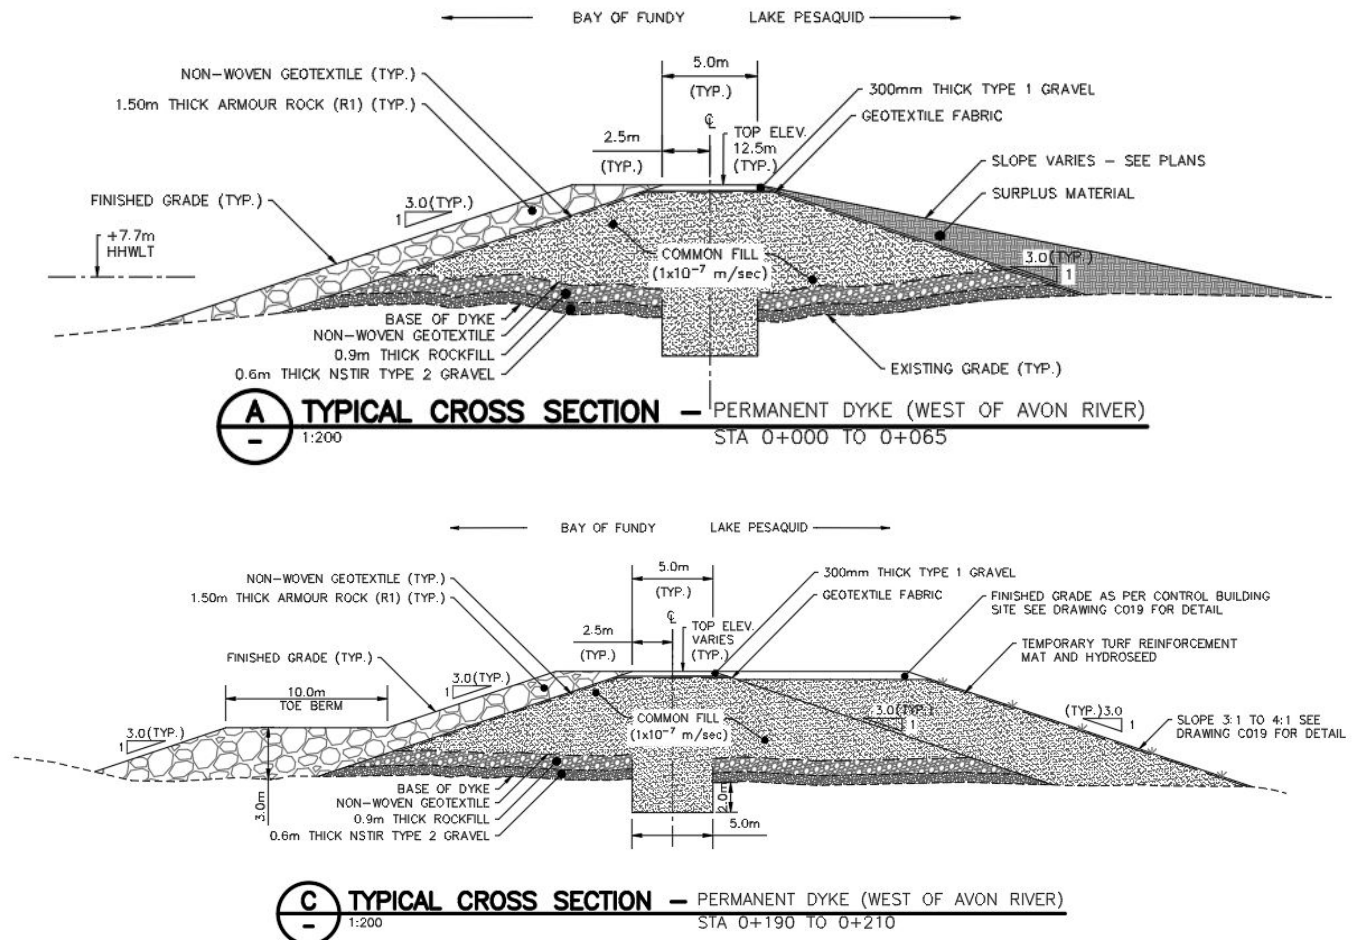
Conceptual Designs of the New Permanent Dyke West of the new Aboiteau Structure.
